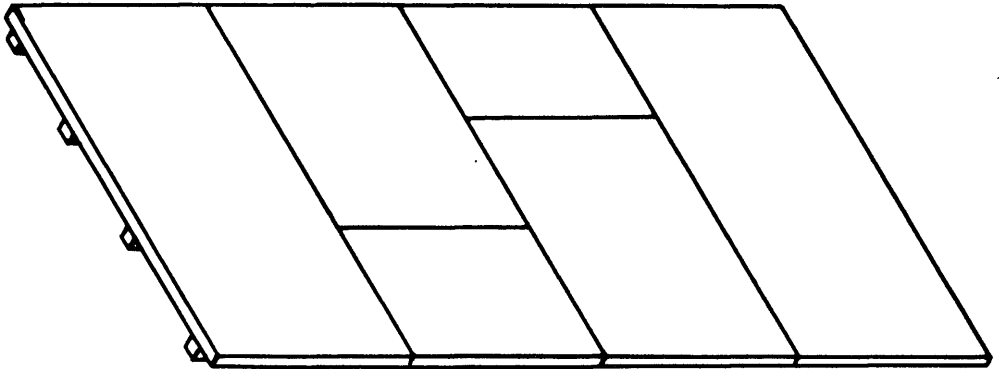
Typical wall construction showing horizontal and vertical joints in application of 2-foot by 8-foot insulating board sheathing
